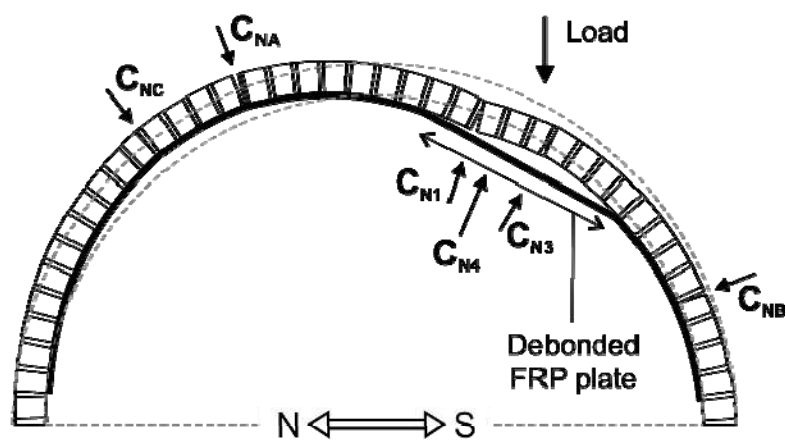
Developed plan view of the arches showing crack locations in the masonry and the extent of debonding after failure of the strengthening system
